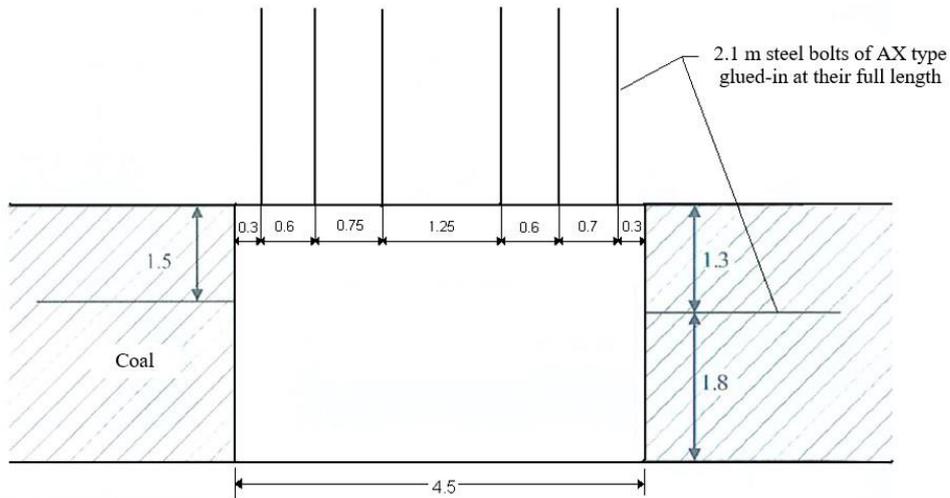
An example of the scheme of independent bolting support – Angus Place mine, Western Coal Field, New South Wales, Australia [96]
